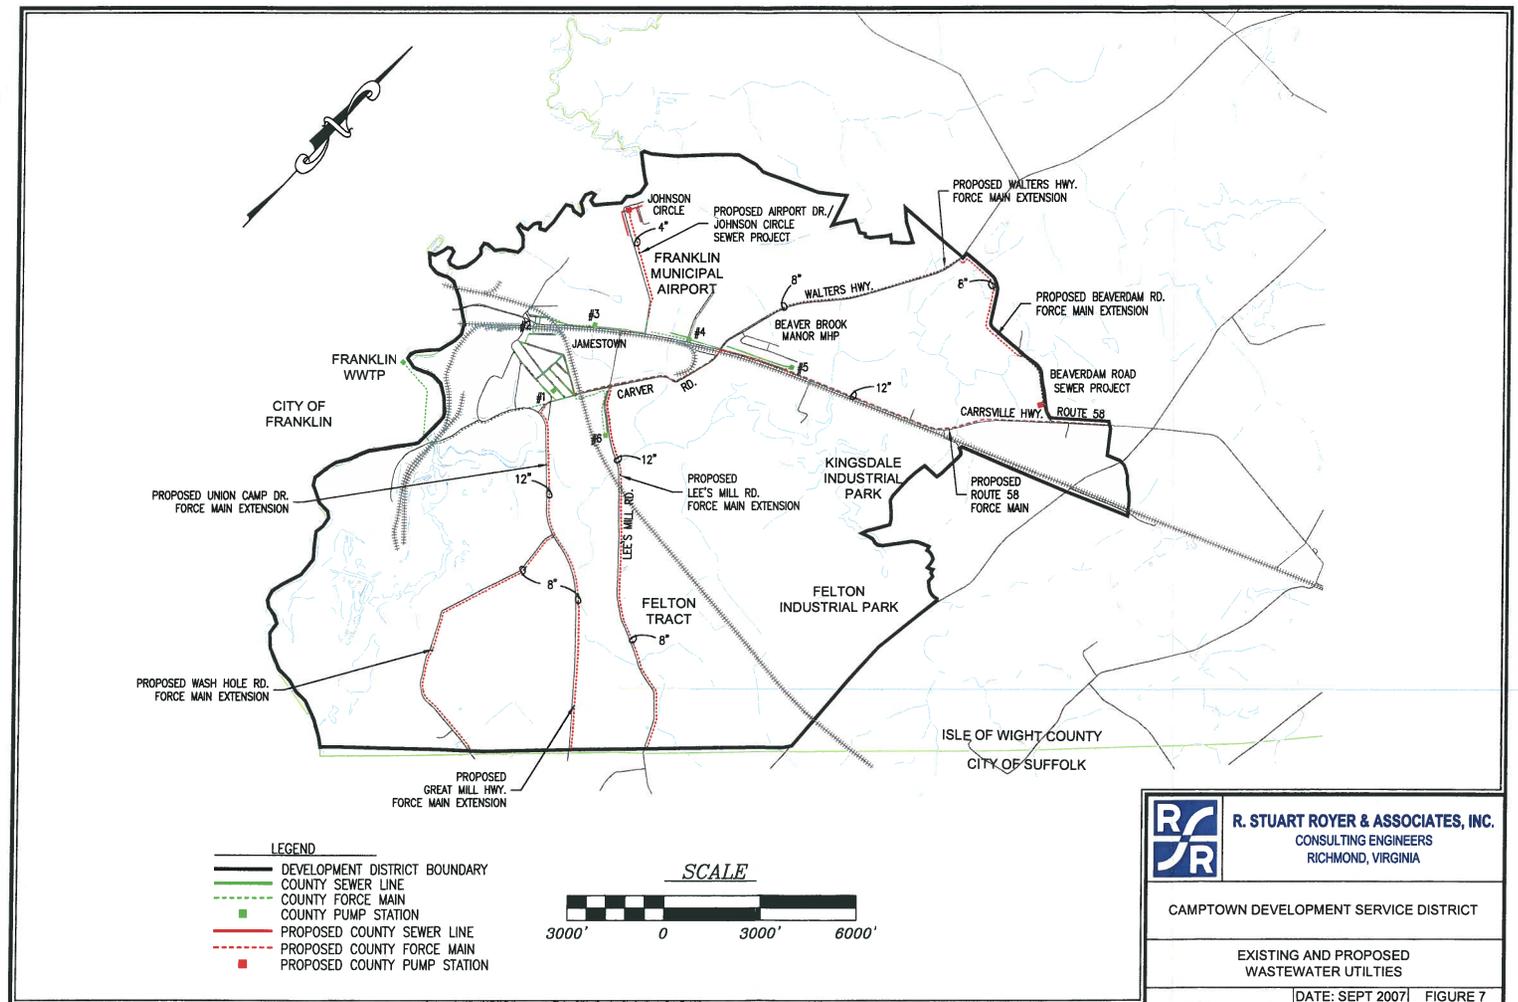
Proposed Wastewater Plan Camptown DSD from the Master Sewer and Water Plan, adopted 2008.
